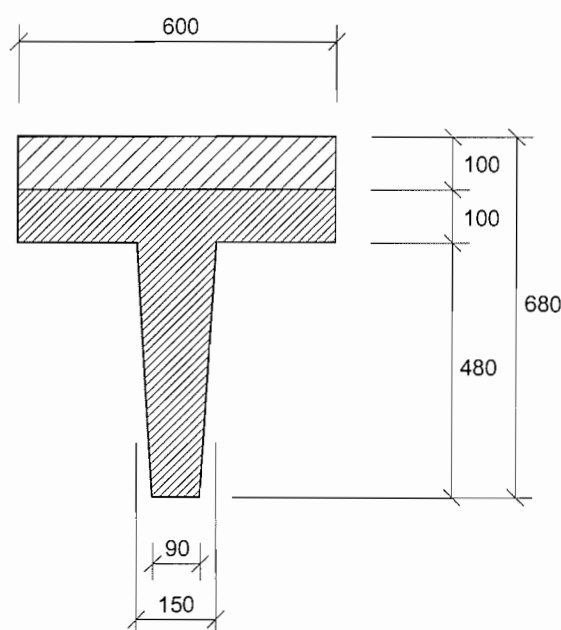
Dimensions of the test beam (one half of the original DT element)
